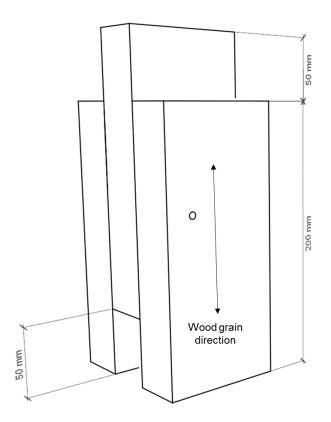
Nail connection test specimen with nails parallel to wood grain
